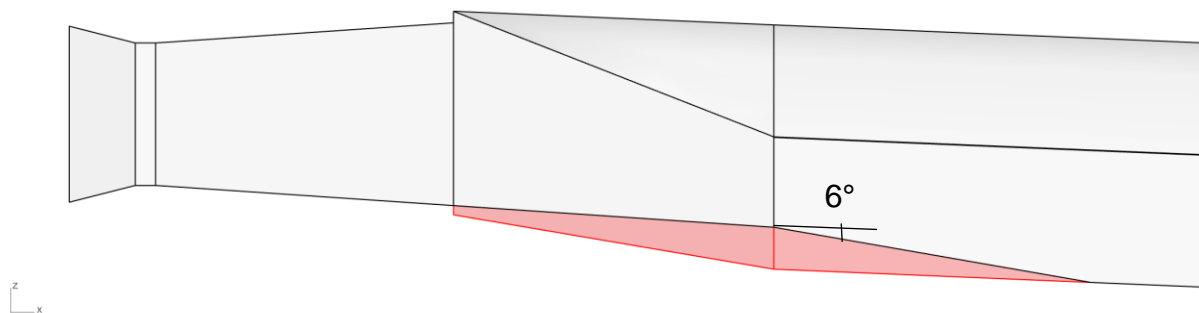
Ramp design approach with continued inclination in the diffuser and 6° angle in the constant sand trap section, side view, detail
